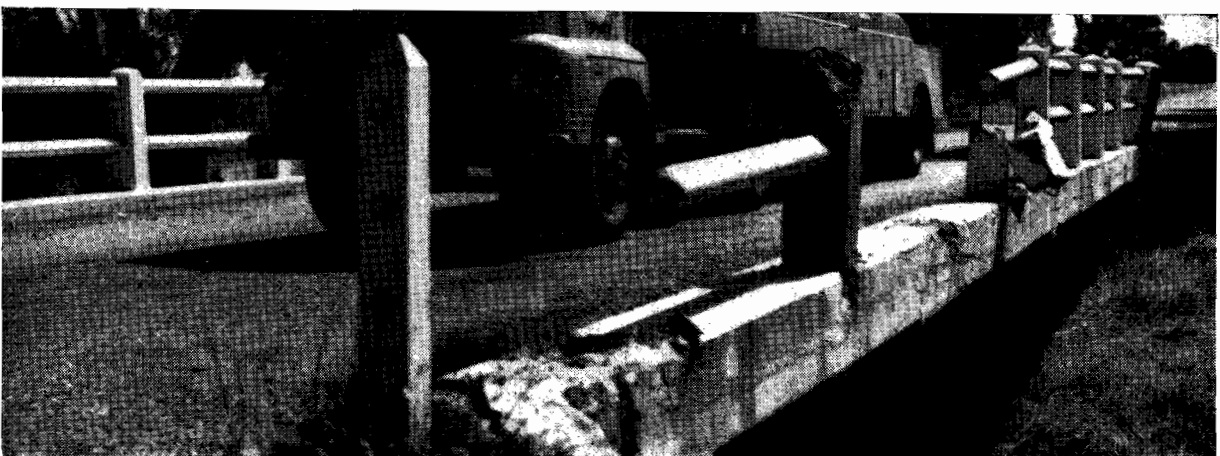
Few handrails have escaped damage from heavy transports.
